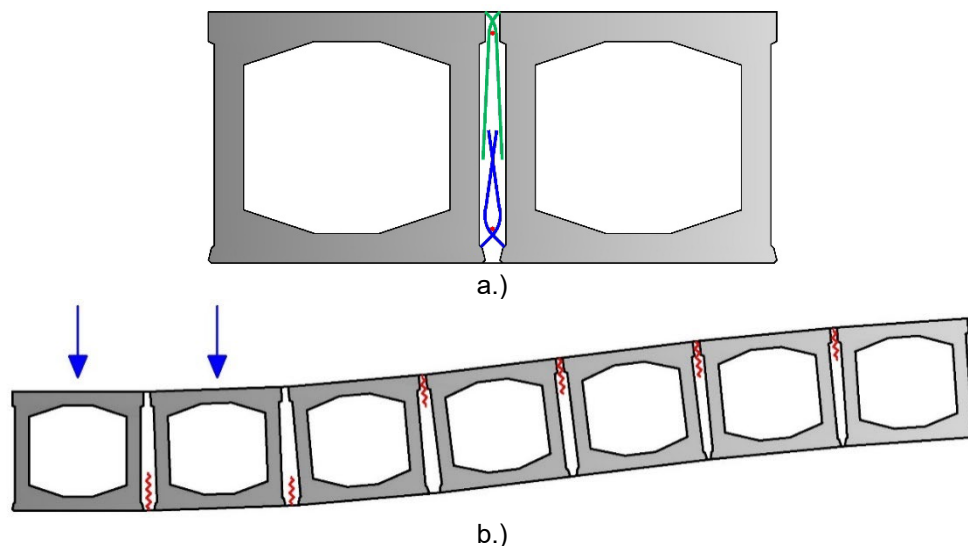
KA box girder – a.) detail on the gap; b.) transversal deformation [1].
